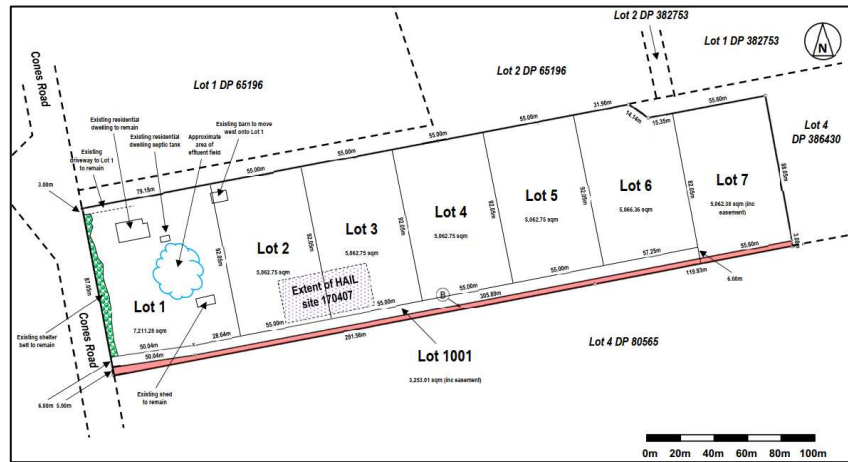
308 Cones Road Proposed Subdivision Layout.
